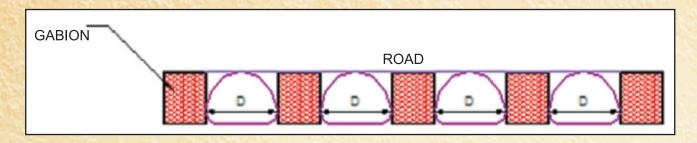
Typical scheme of multiple pipe protection with Gabion Retaining wall
